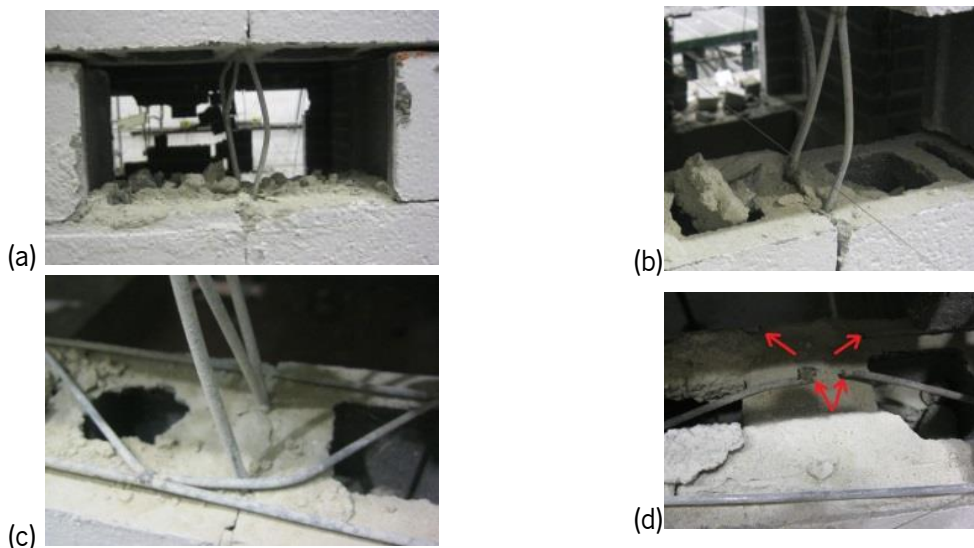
Damage on steel; (a and b) dowel effect in vertical reinforcement; (c) deformation on horizontal reinforcement due to cycle movements; (d) failure of horizontal reinforcement at welding connection
